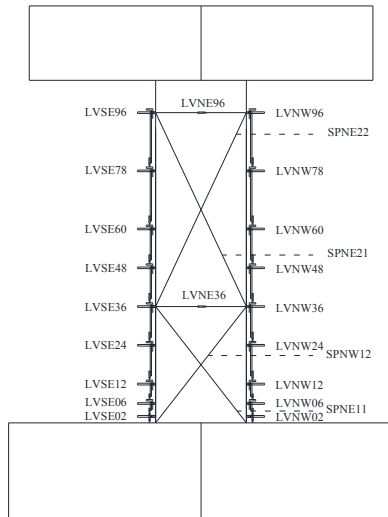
LVDT layout for both RC and UHP-FRC specimens
